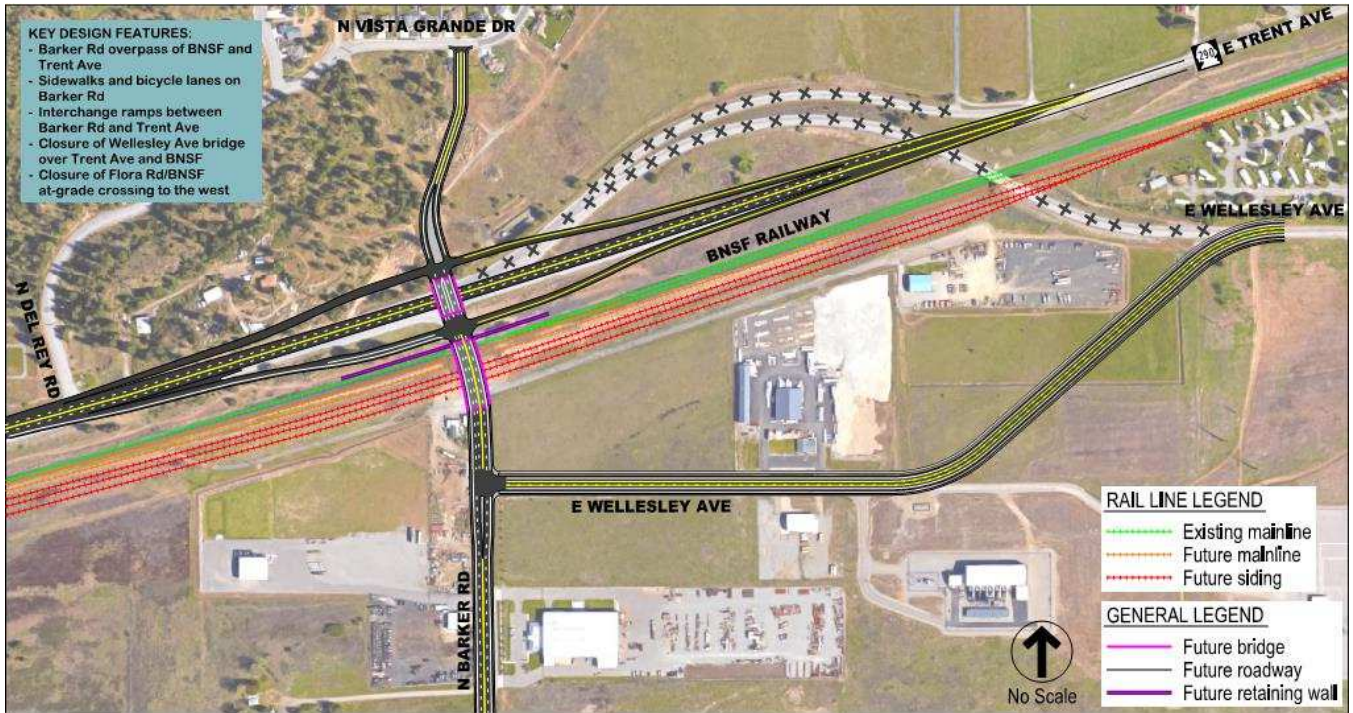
Barker Road/BNSF Grade Separation Conceptual Layout
